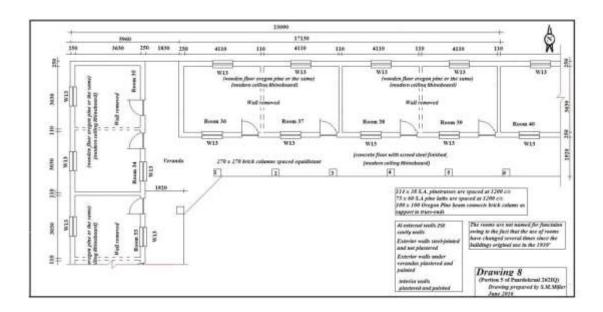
Above. Layout of rooms 33 to 40 in drawing 8. (Drawing S.M. Miller 2016.)
